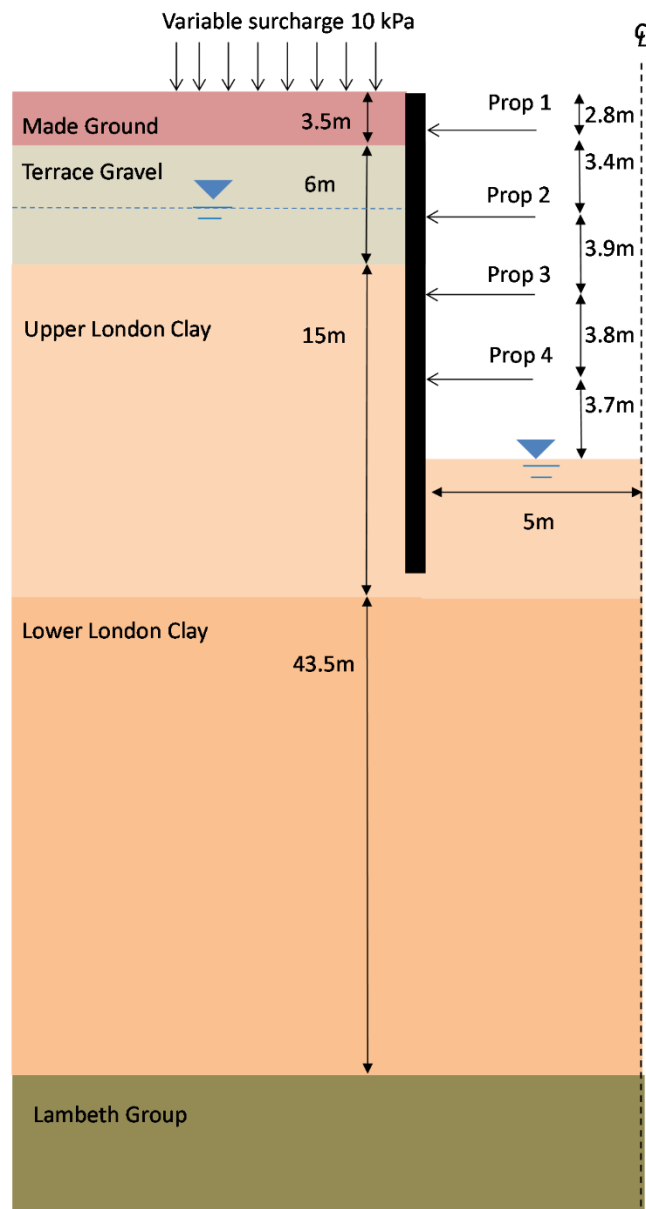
Geometry of the Cross Section 8 in the dog leg excavation area
